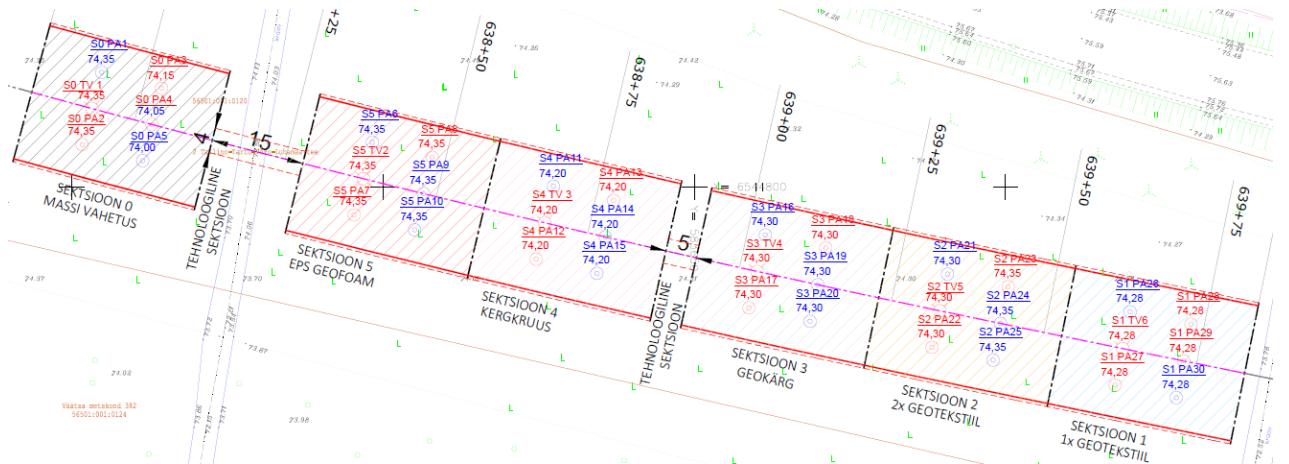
Location of soundings and boreholes. The spacing between 3 and 4 does not exist in the final structure layout.
